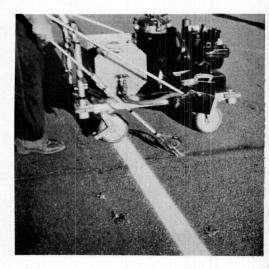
Experimental sealing machine. Primer-Sprayer in operation.
